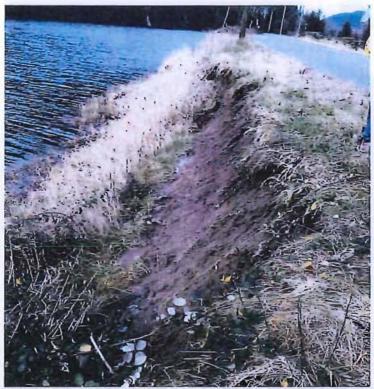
Section of Seabird Island Road embankment sloughing - approximately 10 m long
